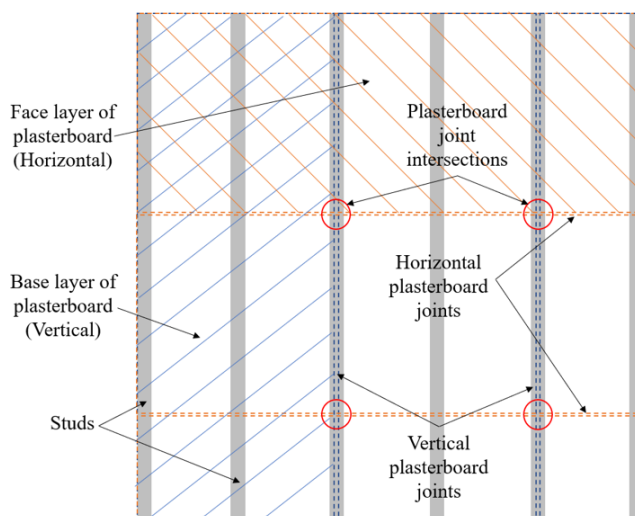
Plasterboard arrangements of LSF wall made of six studs.
